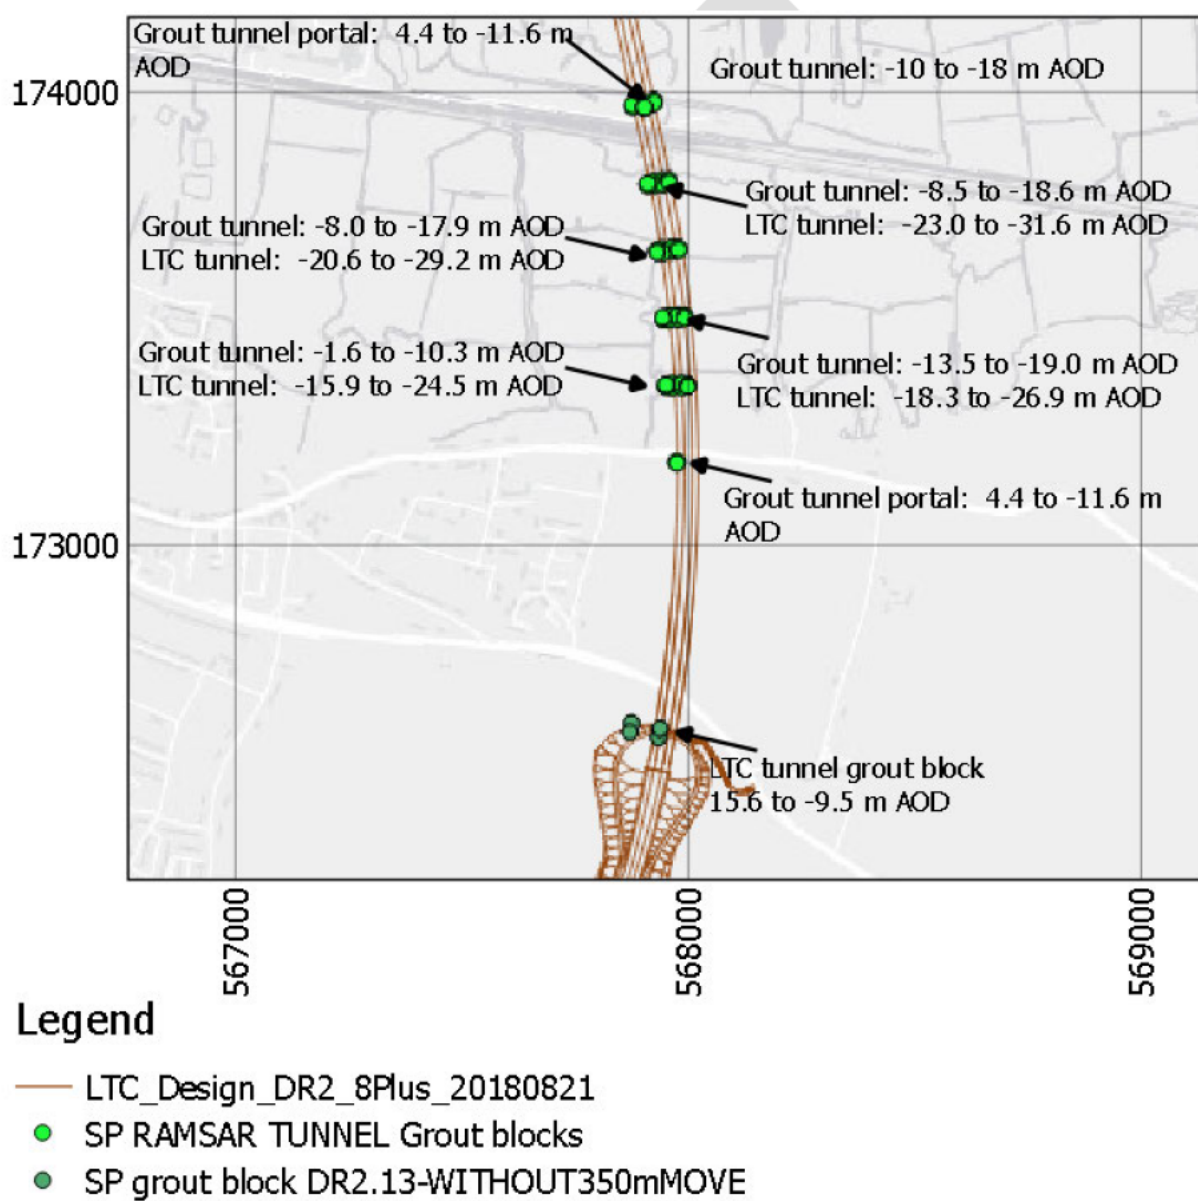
A location plan showing the Grout plugs for the grouting tunnel and LTC tunnel, including their elevations
